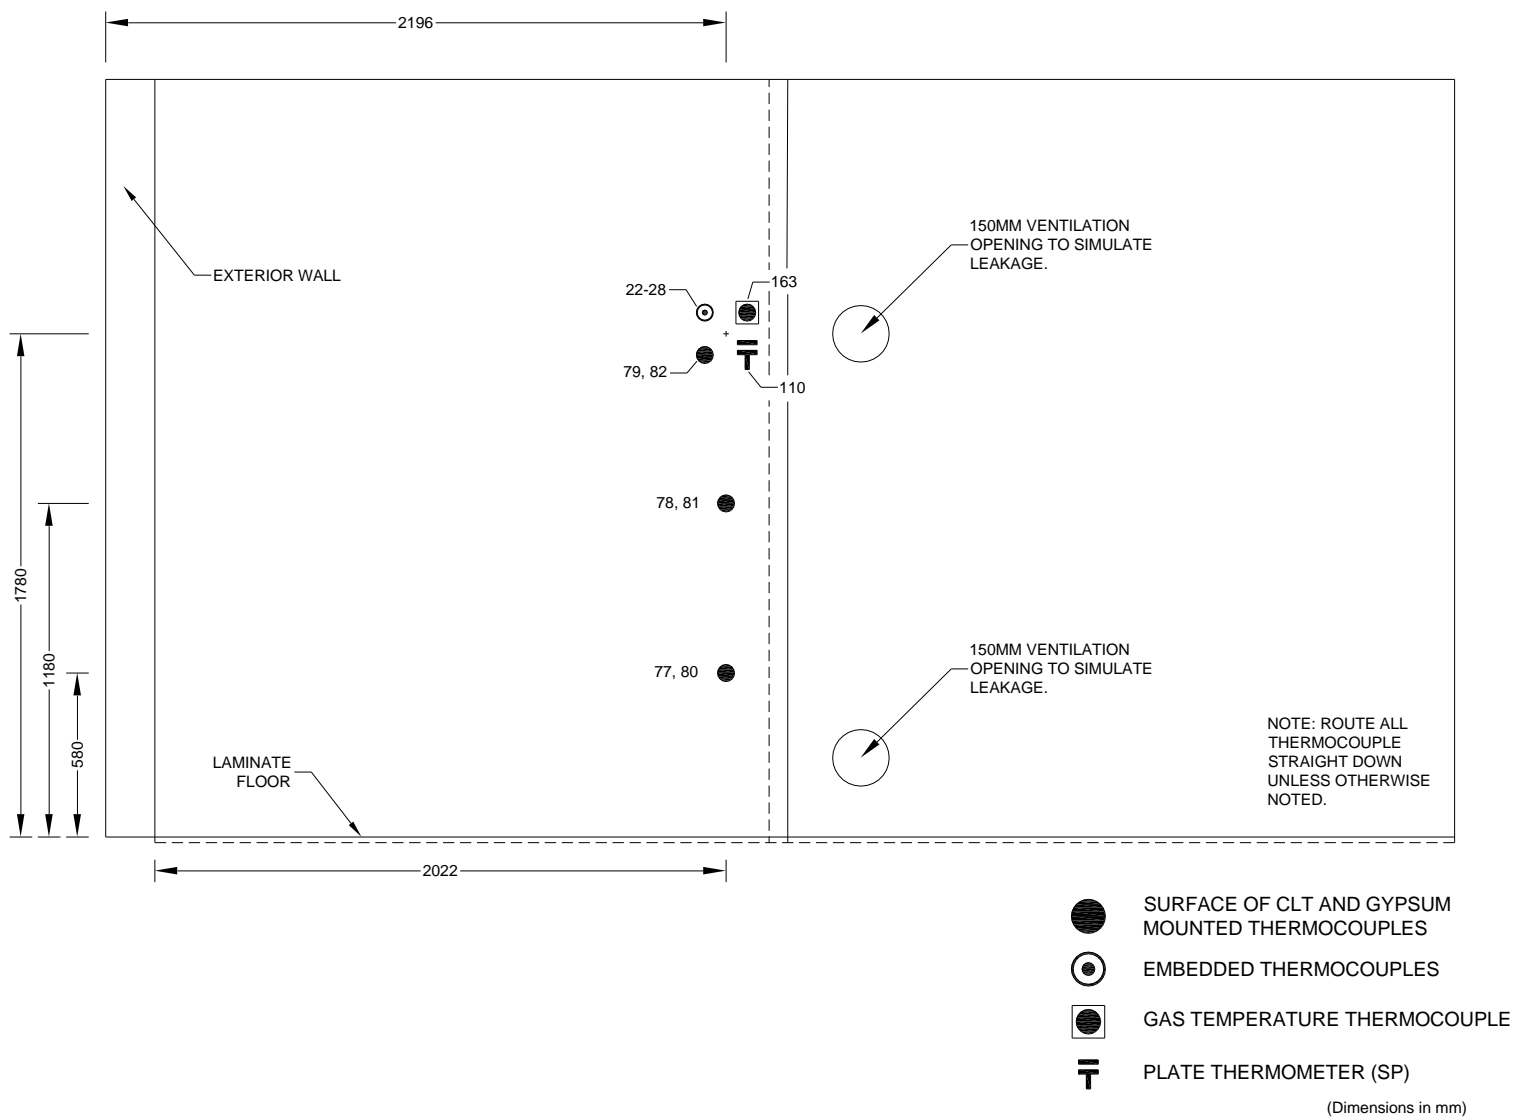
Test 1-3 Large Compartment CLT - W4 - Instrumentation Layout
